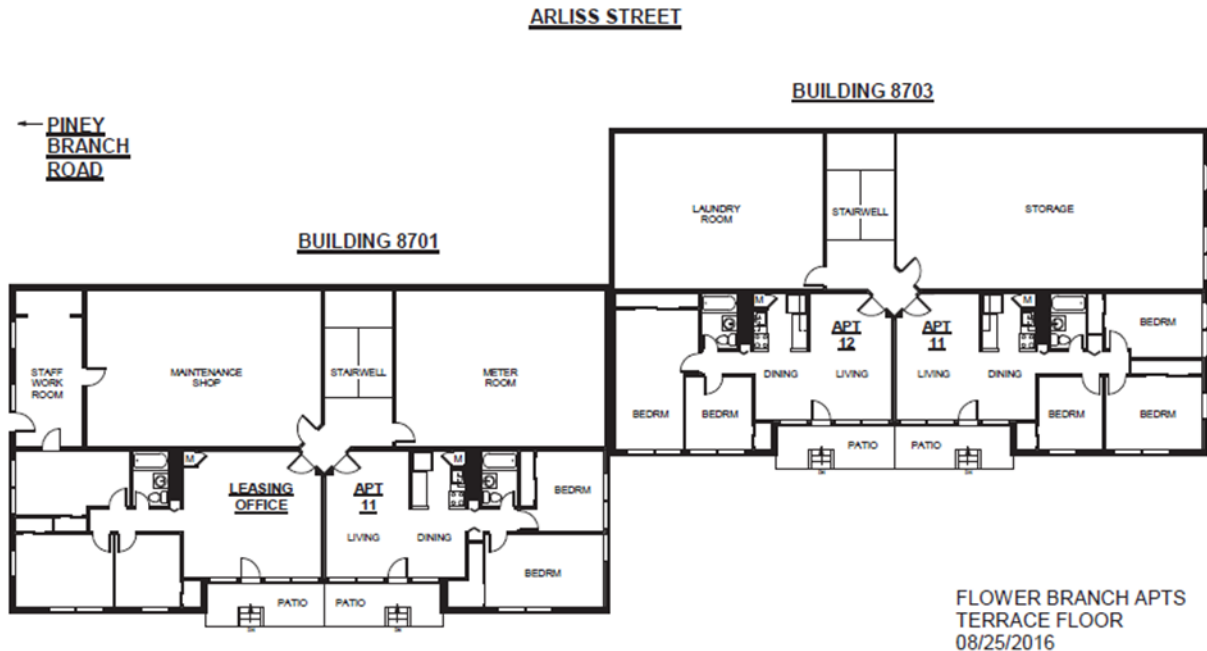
Adjoining buildings, 8701 and 8703, basement floor plans showing the incident building meter room and adjacent rooms on the left.
